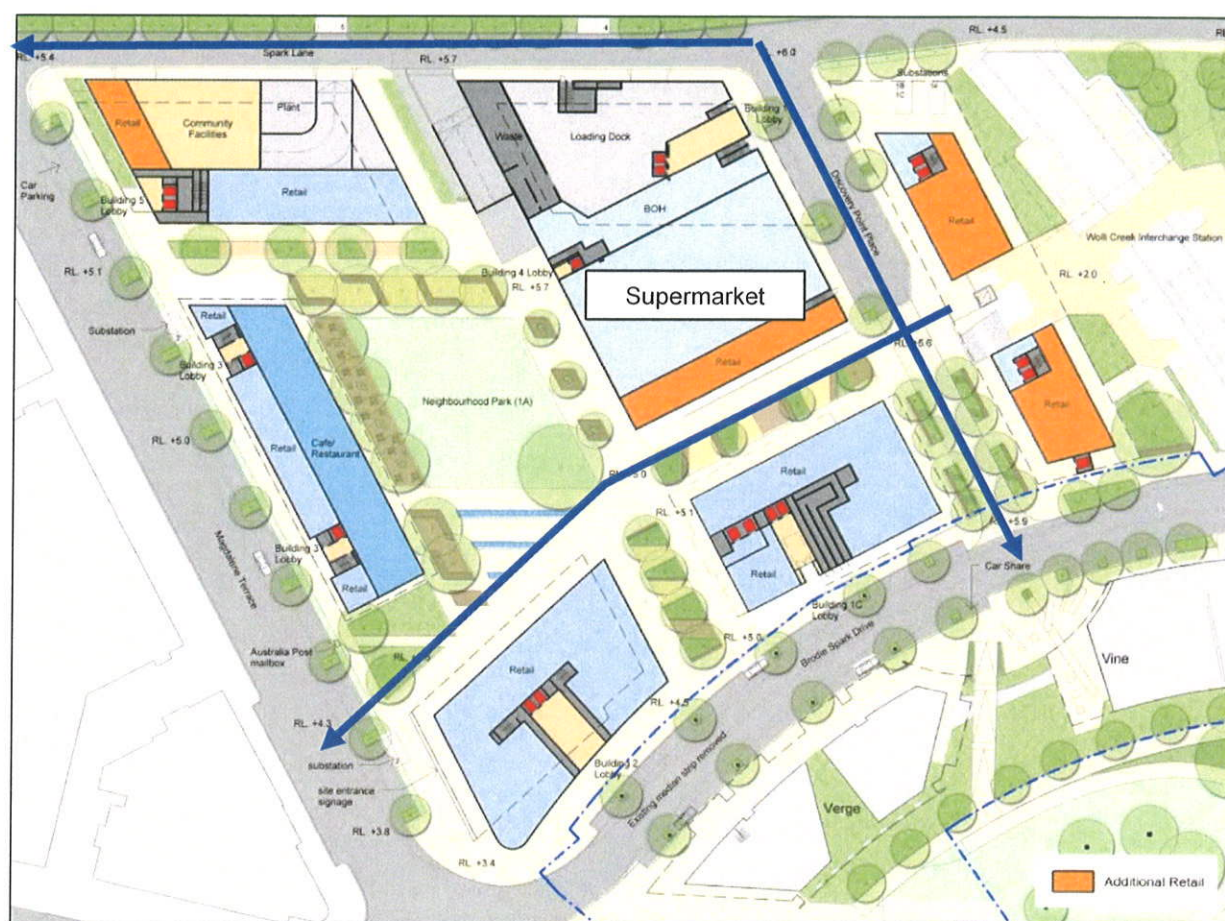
Revised indicative ground floor layout to improve retail activation along pedestrian routes (indicated by blue arrows), as contained in PPR
